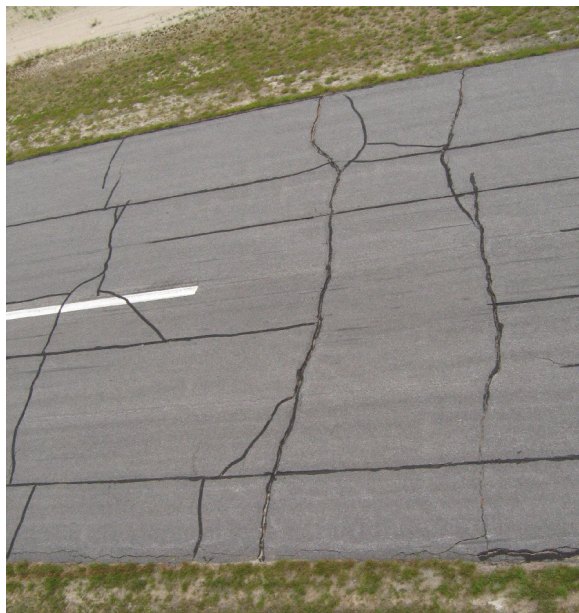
Pavement rating FAIR. Thermal cracks less than 50 feet apart with minor deterioration along cracks. Block cracks 6 to 10 feet apart.
